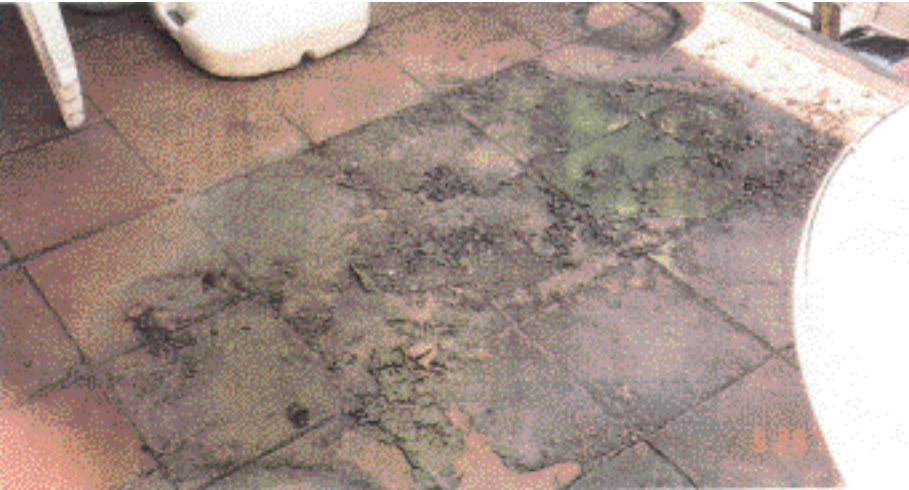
Besides ruining the finish surface, ponding on waterproof decks also leads to deterioration of the framing below.
